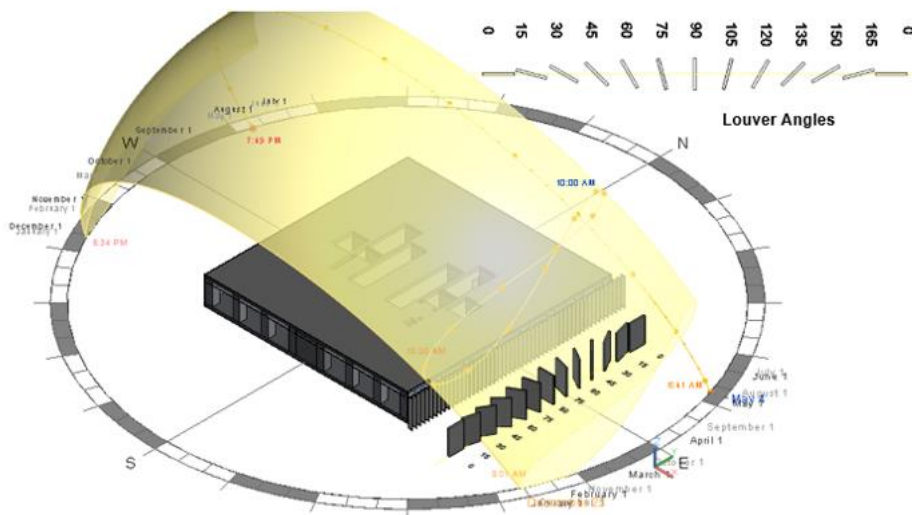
3D views detailed the North elevation louver configurations with the sun path (Revit Software).
